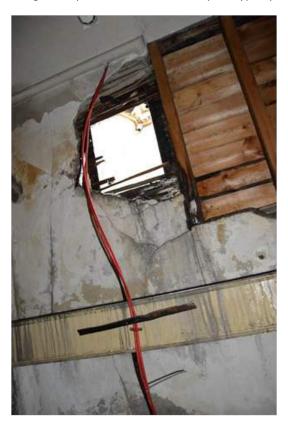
Damage to roof behind tower. Note later wood planks.
